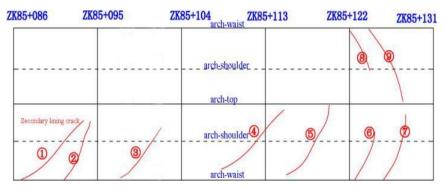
Schematic of tunnel lining cracking expansion based on site record
